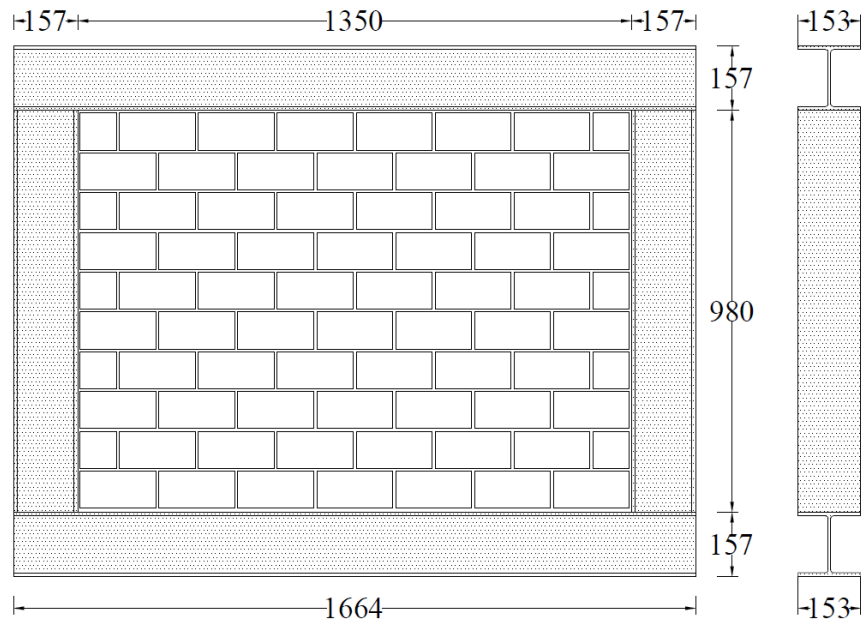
Infilled Frame Specimen IF-S (unit: mm)
